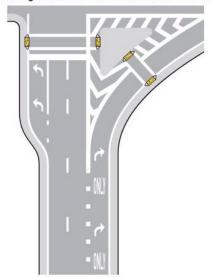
J-4. Example of Pavement Markings for Raised Islands (Sheet 2 of 2)
